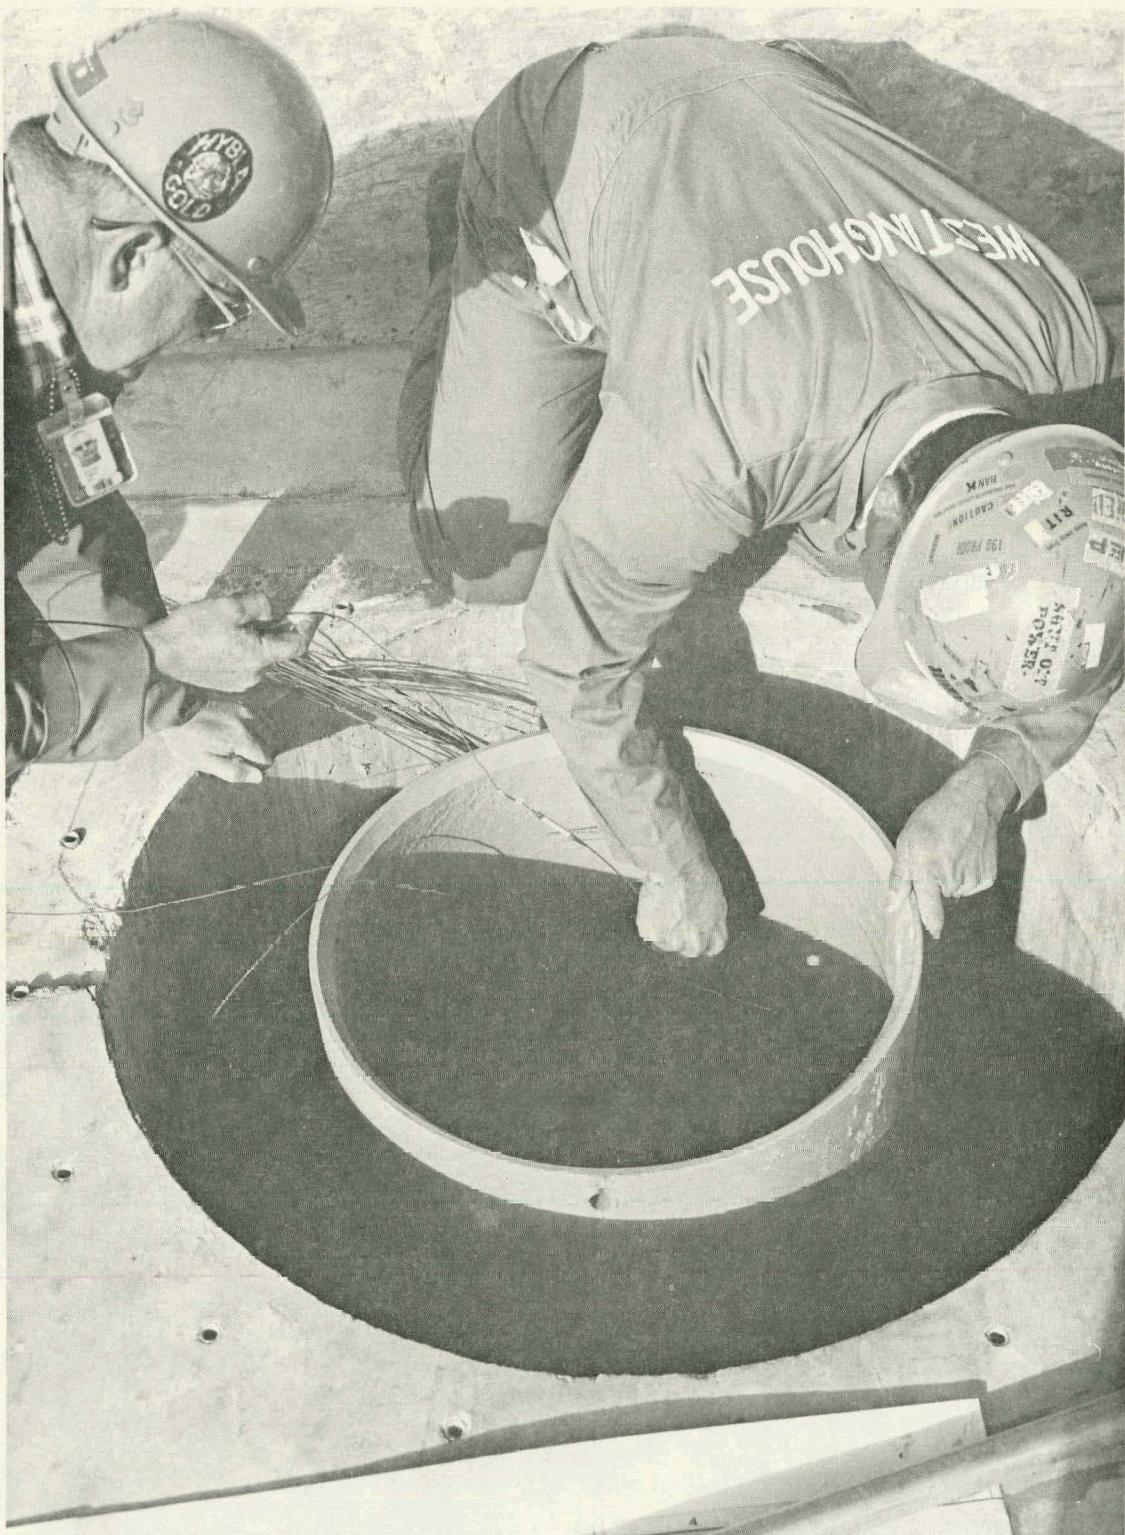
Insertion of Thermocouples Into Drywell and Into Canister Through Shield Plug
